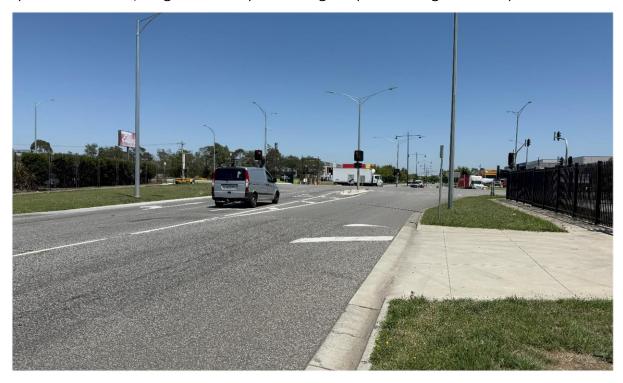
LIVESTOCK WAY LOOKING WEST (SOURCE: SITE INSPECTION)
